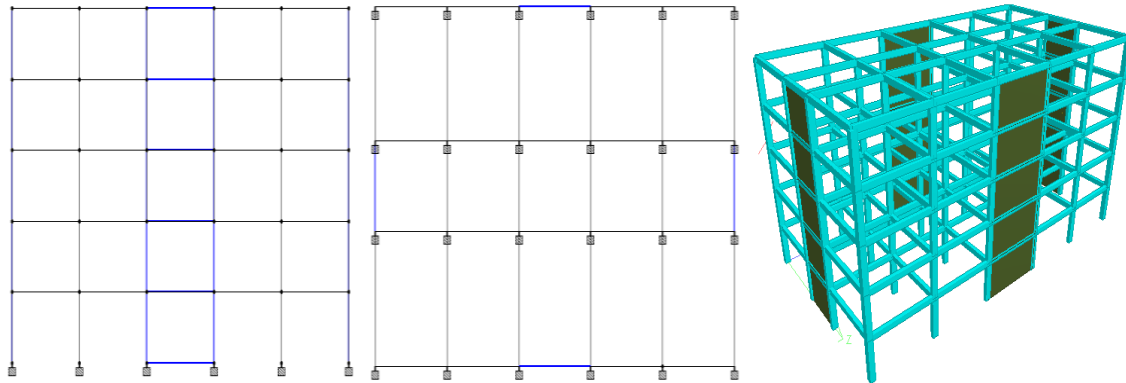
Plan and 3D View of a (G+4) Storey Building Frame With Shear Walls
